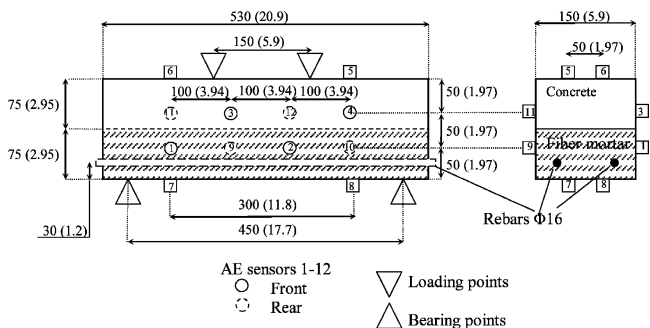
Specimen geometry and sensor location. Dimensions are in mm (in.).
